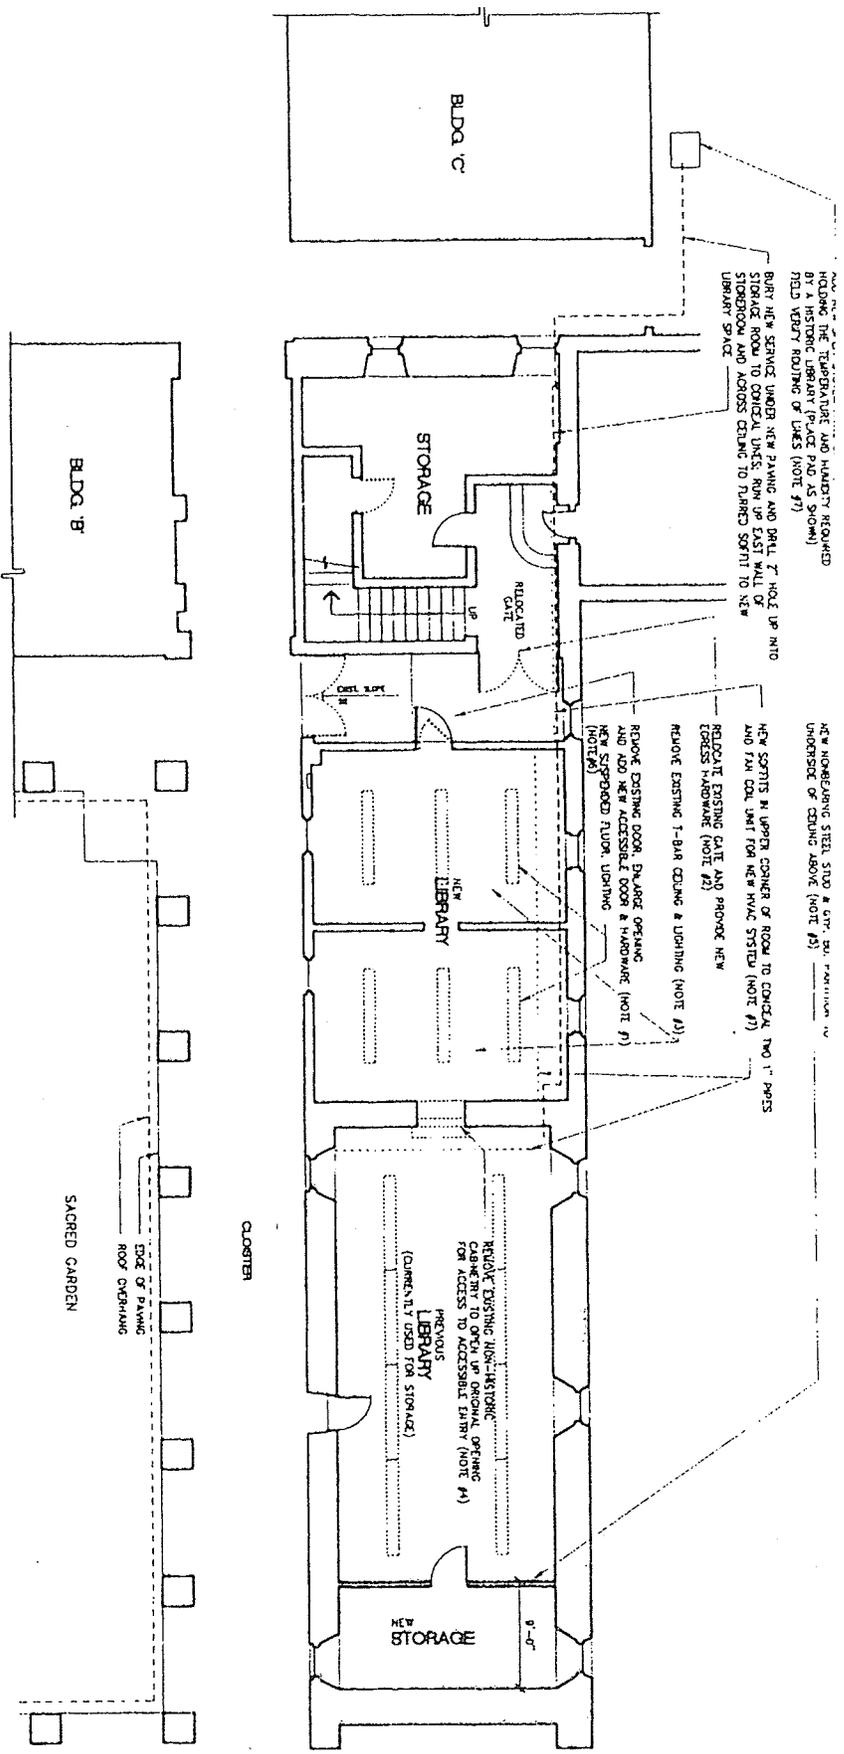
This wing was constructed in 1949 and officially opened in 1950, and includes a portion of the adjacent colonnade (Mary Whelan, personal communication 2013). The footprint of the wing was constructed on the original Mission foundation. The buildings, which show prior exterior alterations, such as the inclosure of windows and doorways, and replacement of tile concrete flooring, are now approximately 63 years old.
